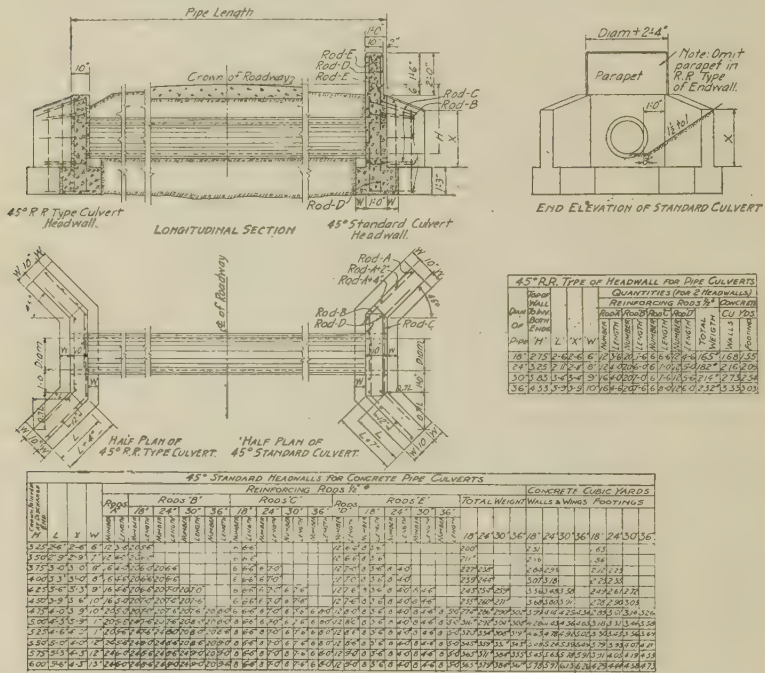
STANDARD PIPE CULVERTS, STATE HIGHWAY DEPARTMENT OF DELAWARE.
